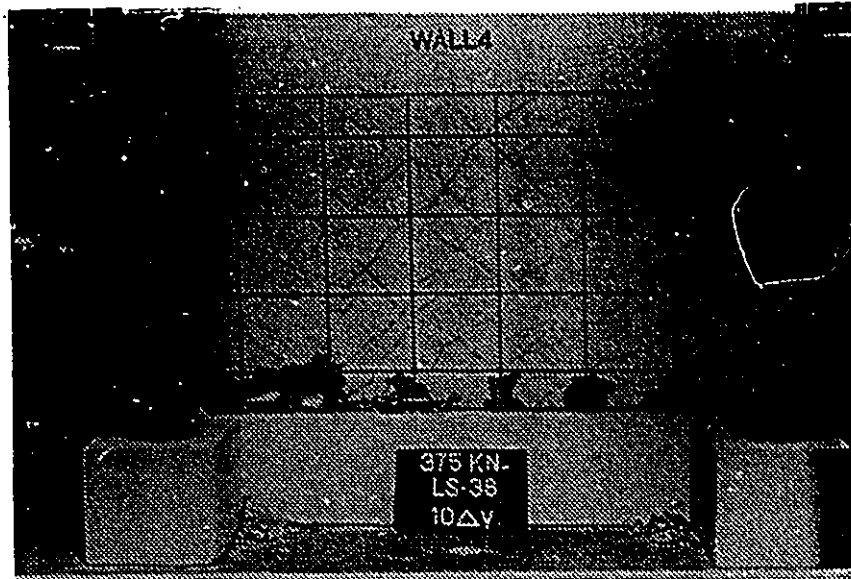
Wall 4 crack pattern at $-10\Delta_v$ and end of test
